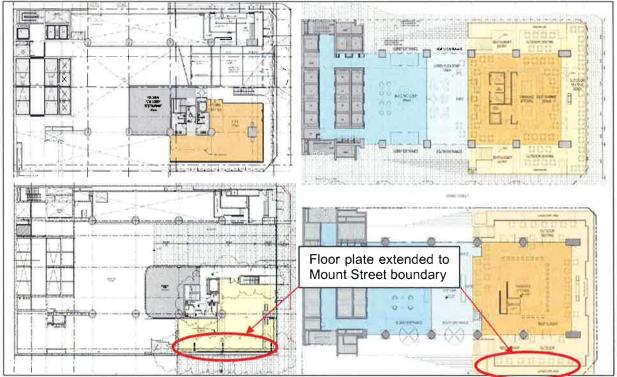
Approved (top) and proposed (bottom) lower ground floorplan
